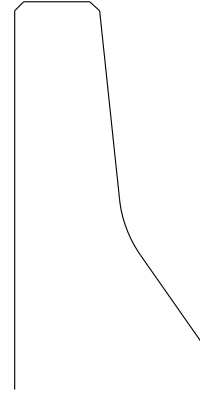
Ex Barrier Sec 32 NJ Cell (Barriers and Rails Library)
